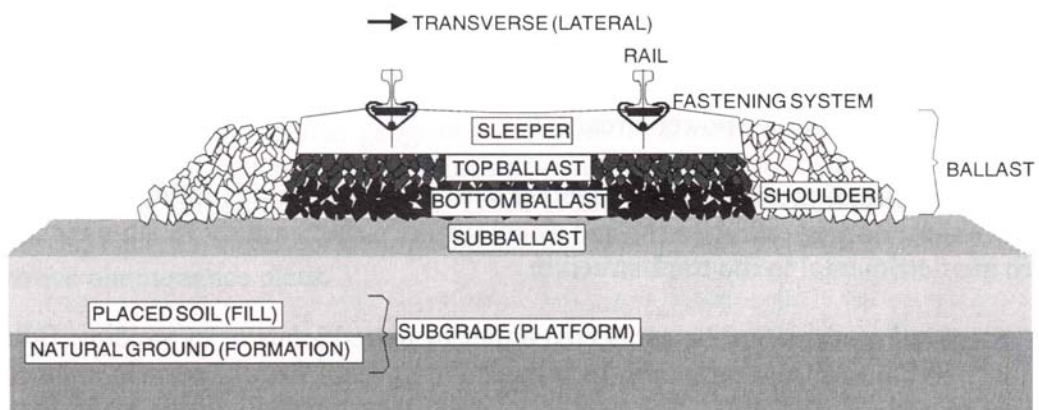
Cross sectional view of a typical rail track (Selig and Waters, 1994)
